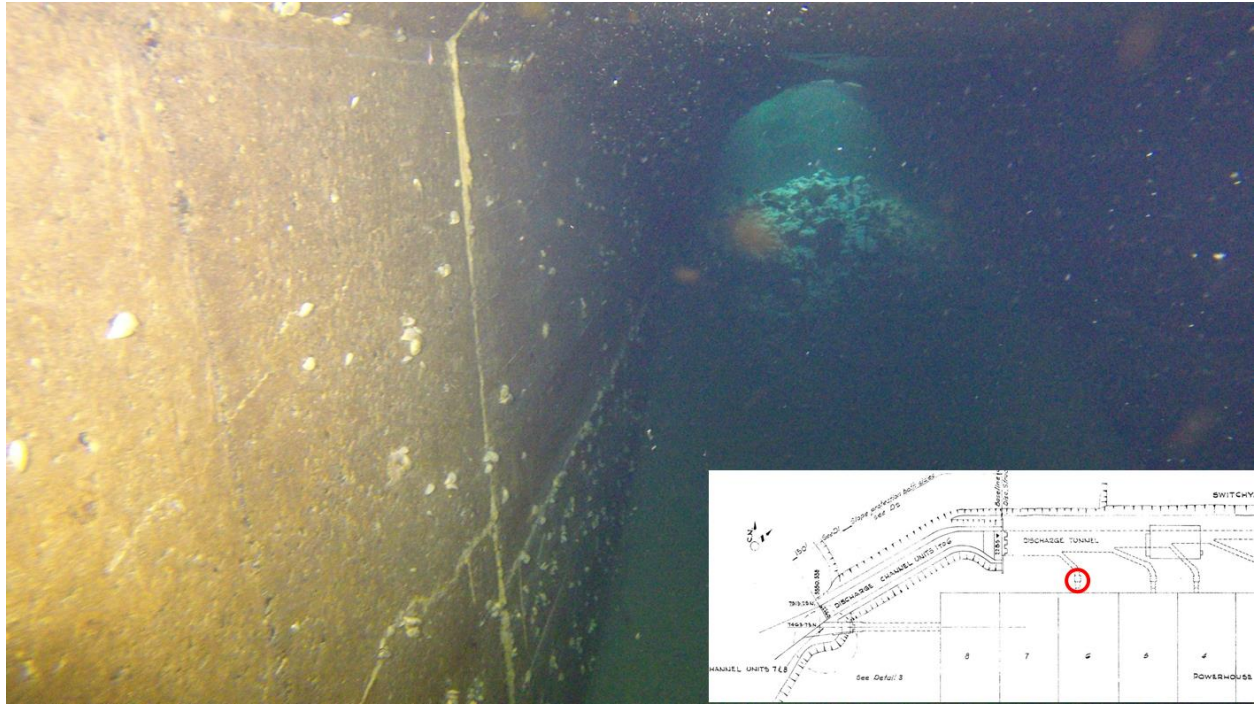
ROV view inside of Unit 6 discharge tunnel showing transition from box to circular pipe and fallen debris through an opening up to demolition of plant
